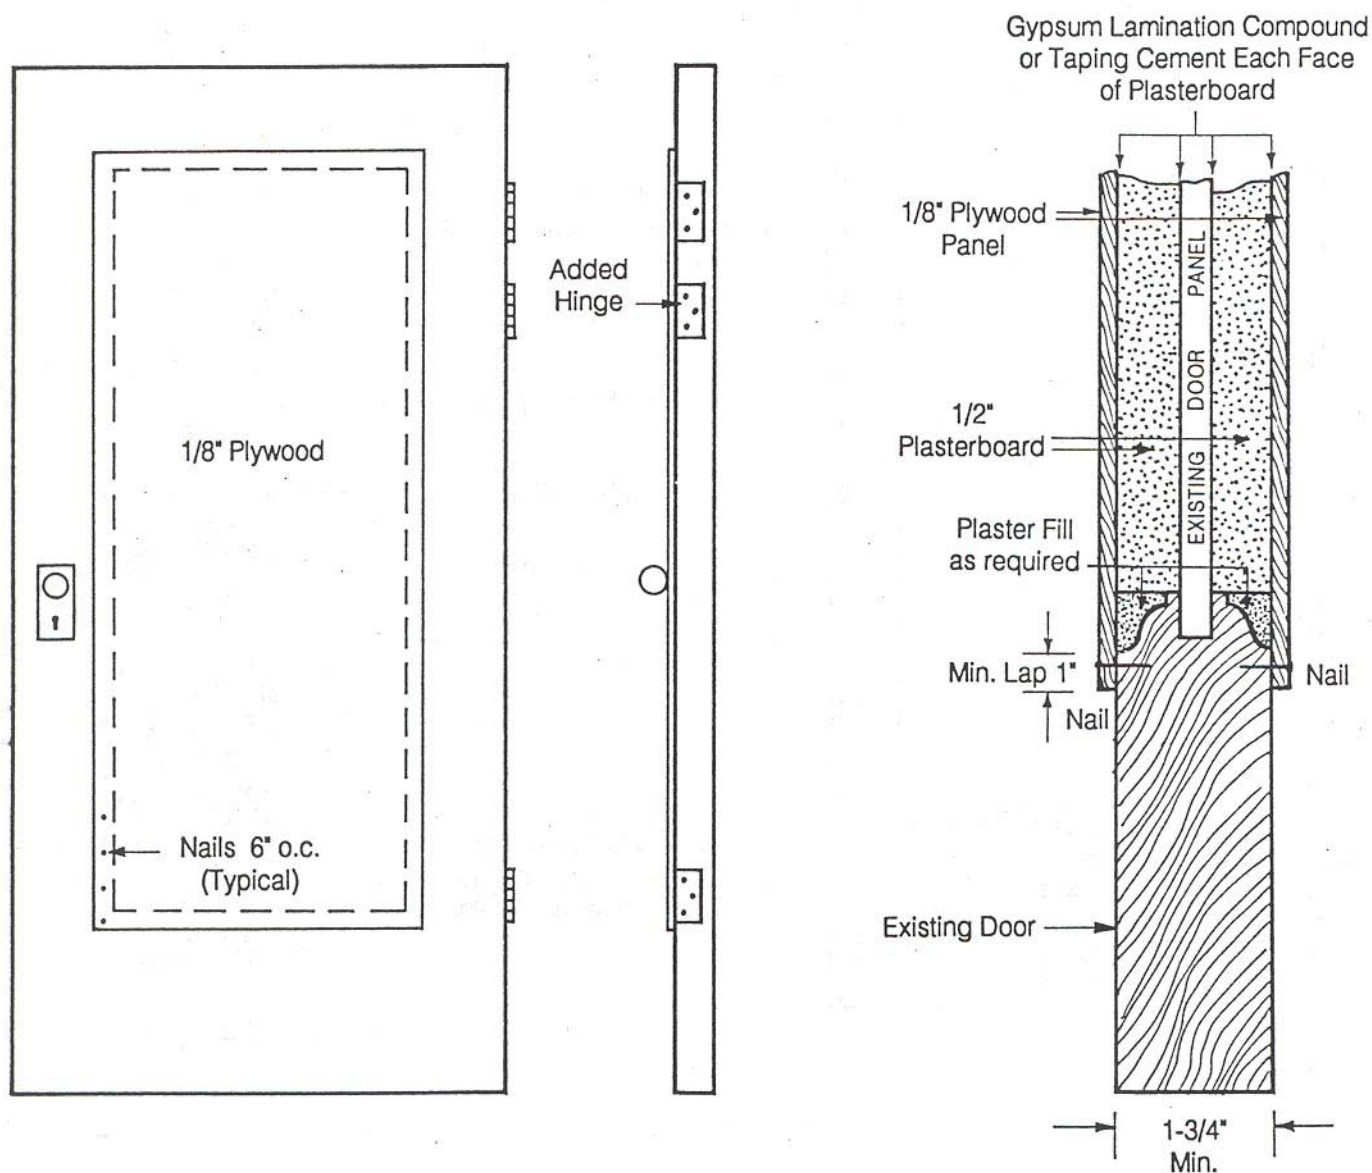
Acceptable Alternatives to 1-Hour Stairway Doors
